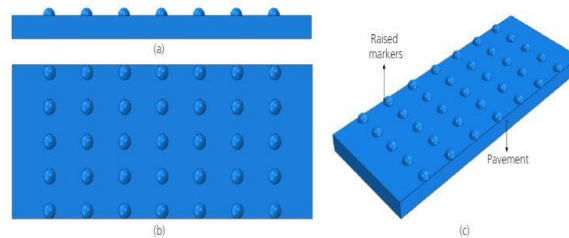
Raised pavement marker-based musical road: (a) elevation; (b) plan; (c) 3D view
